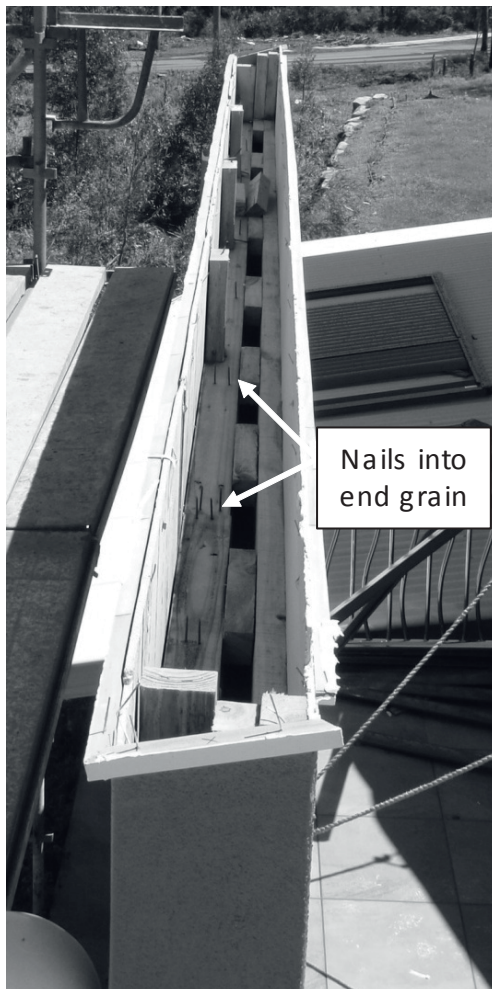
Detailed view inside FC cladding to patio beam showing failure of nailed joints to jack studs.
